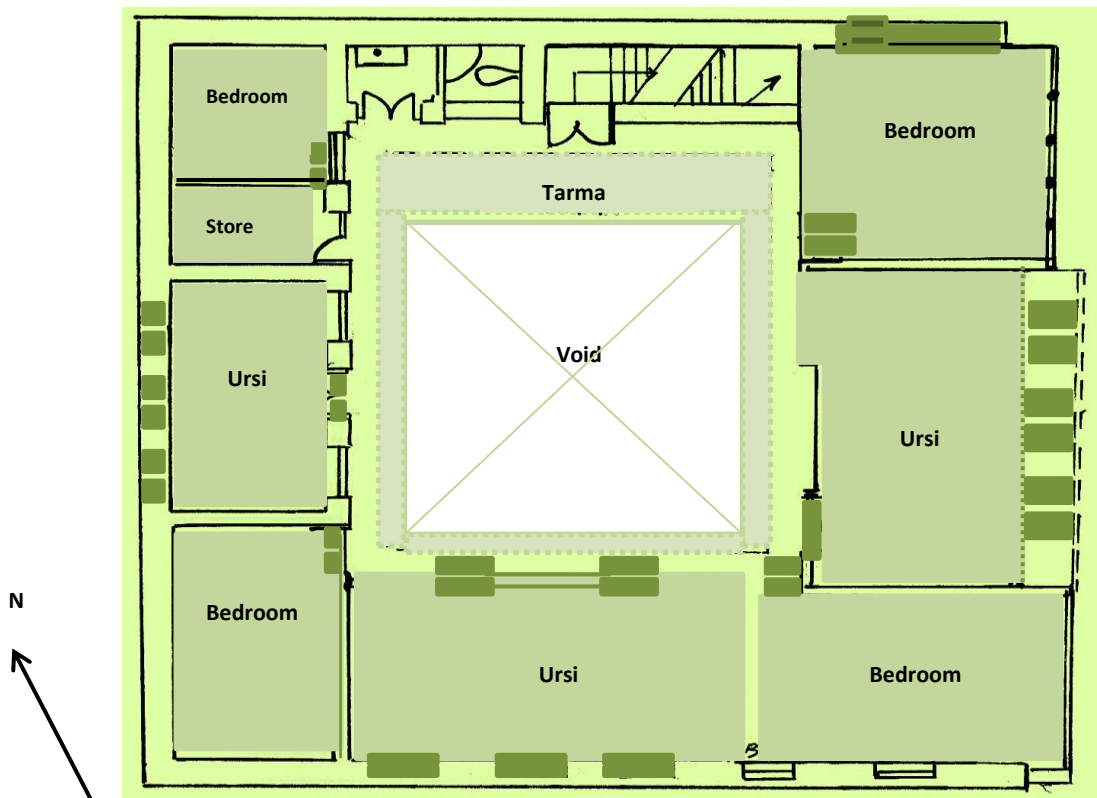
First floor level plan of traditional courtyard house No. 7. Scale: 1:50
